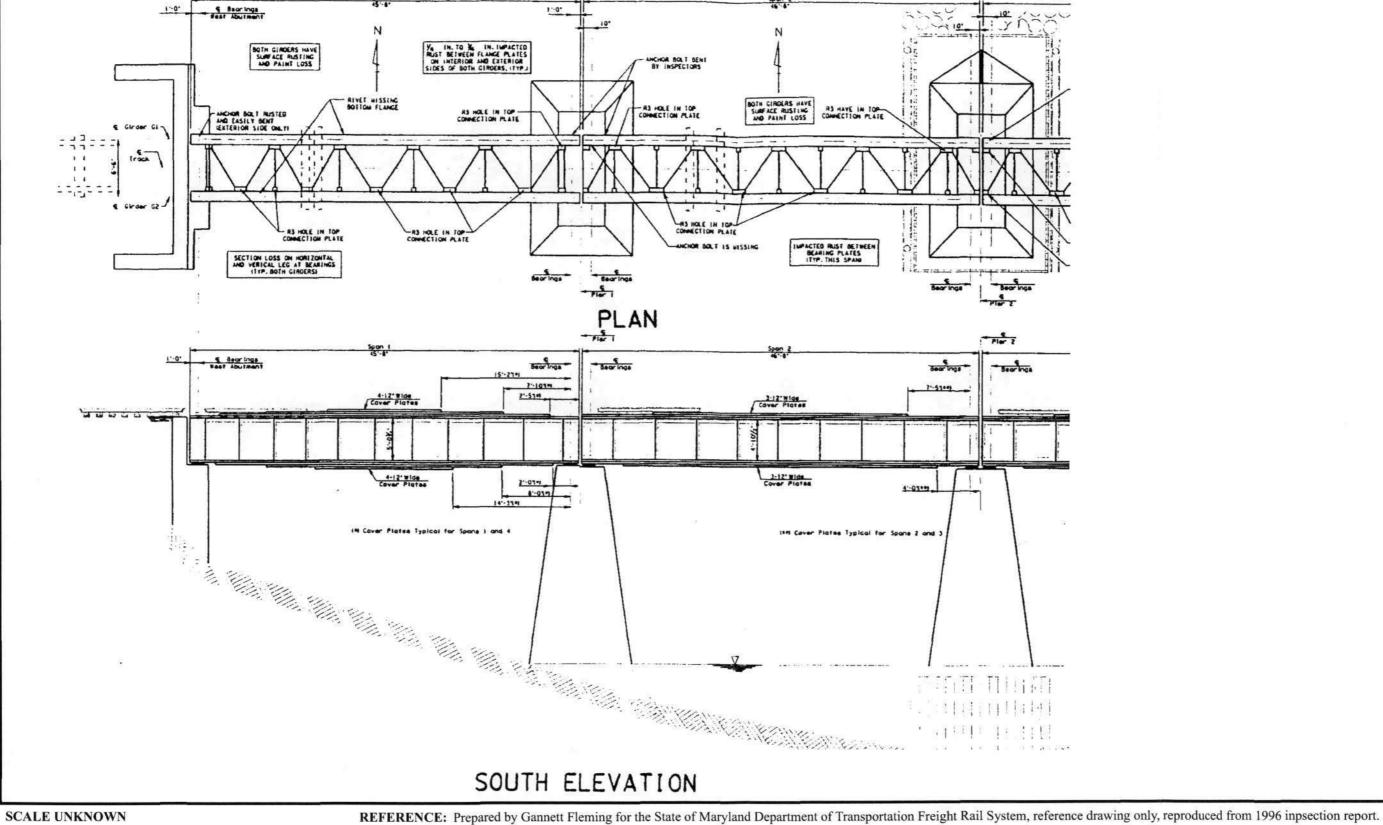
SOUTH ELEVATION (LEFT SIDE) OF RAILROAD BRIDGE 32.03 MARYLAND INVENTORY OF HISTORIC PROPERTIES FORM
